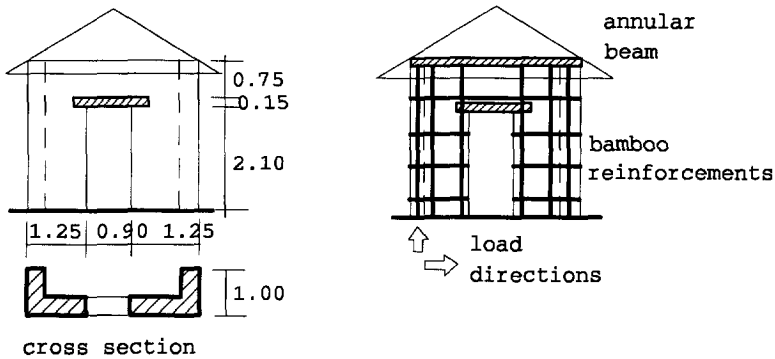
Front wall of a one-storey house (measures in mm)
